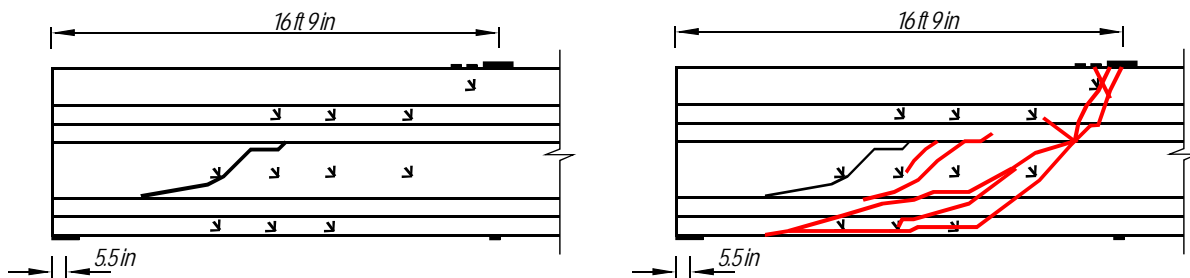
First and final crack patterns of B1U4 (flexural cracks not shown).
